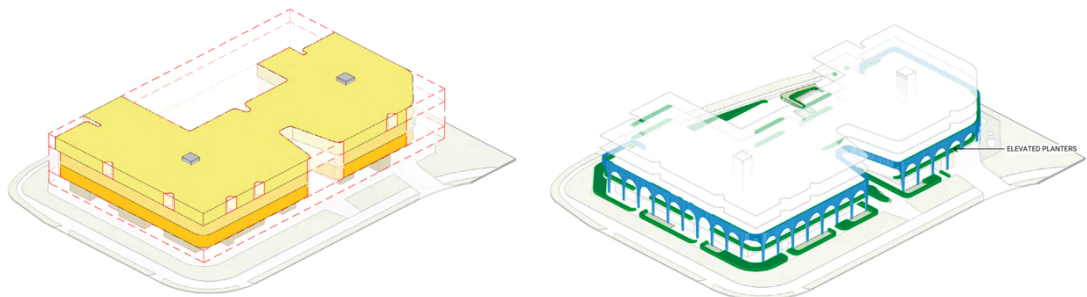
Building massing showing building recess (left) and podium screening and elevated planters (right) (Source: DA Plans by plus architecture dated June 2021)
